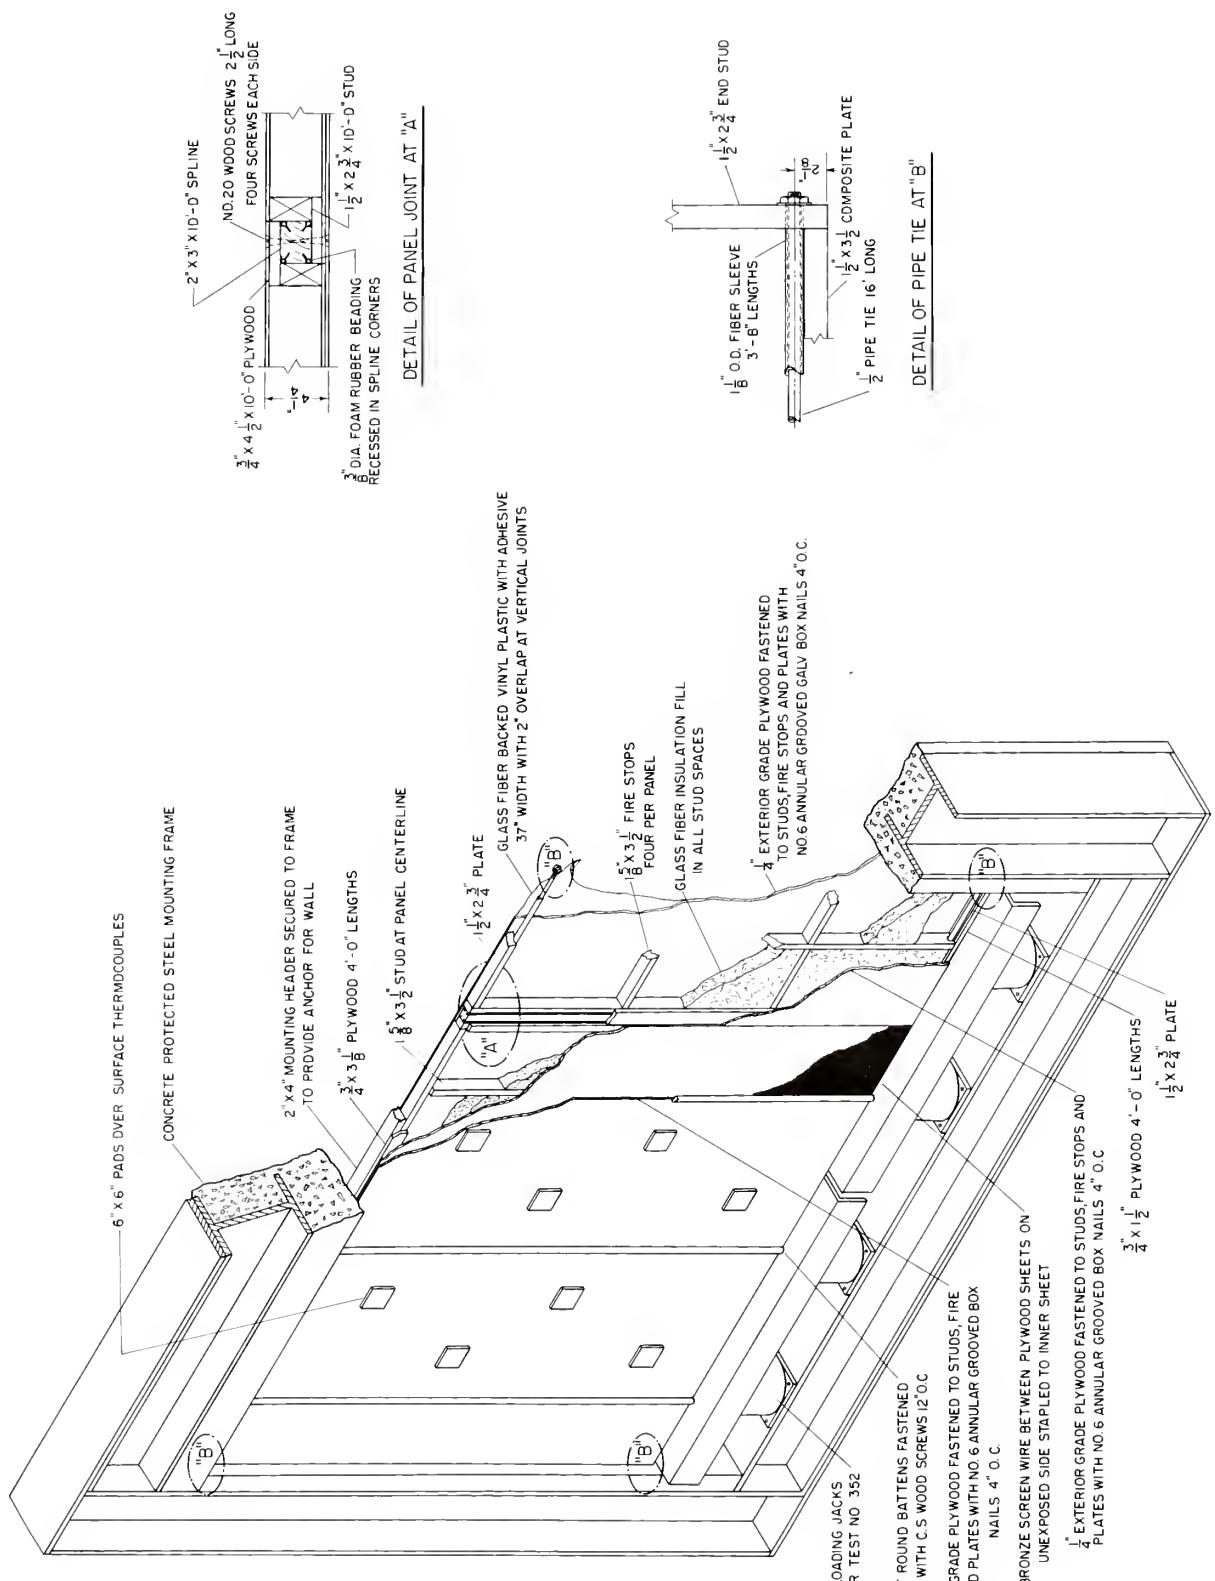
FIG. I CONSTRUCTION AND MOUNTING DETAILS OF PREFABRICATED WOODEN EXTERIOR WALL
